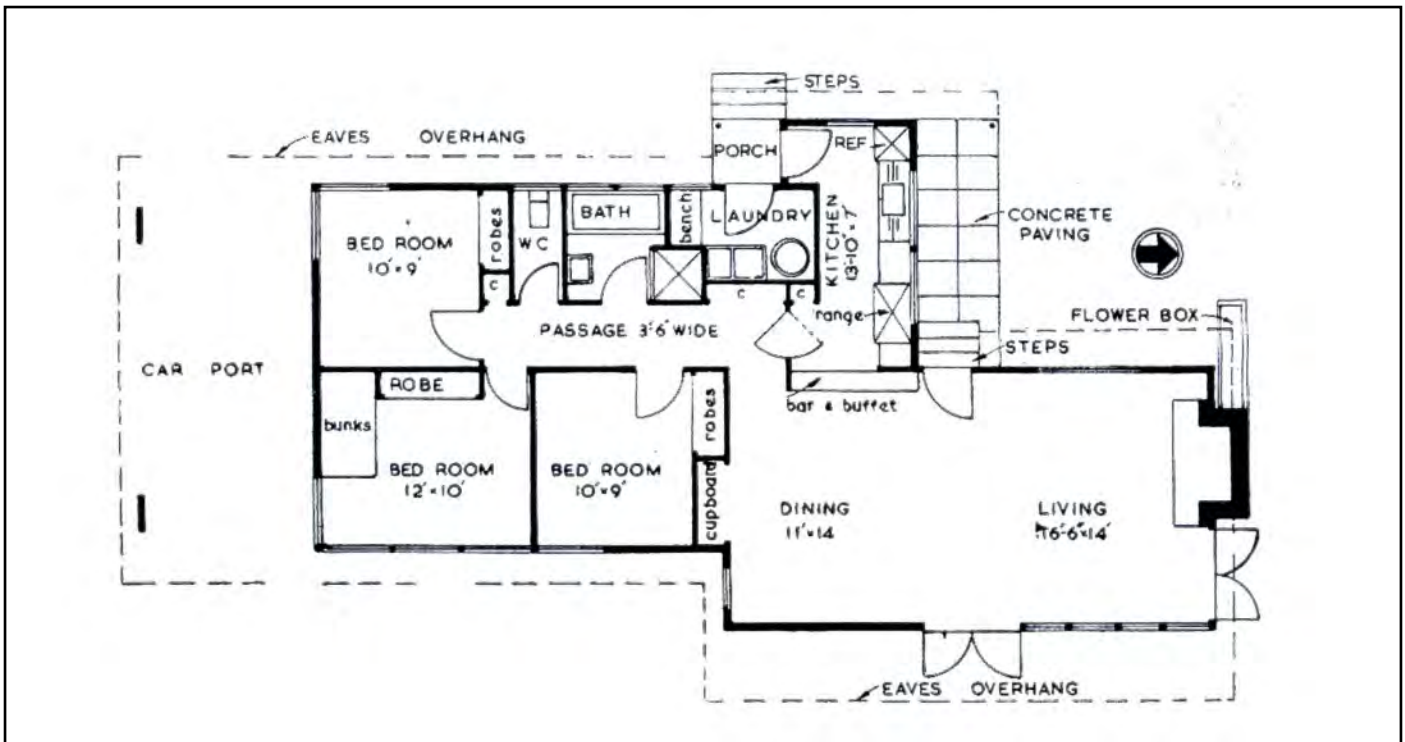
The plan of *La Cabana* (Norman 1951, p.43). [Chris Betteridge collection]
